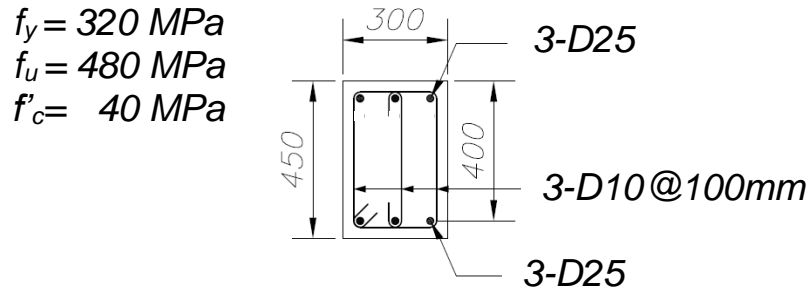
Material properties and beam section details (longitudinal reinforcement ratio ρ_s of 1.23%) used for the section analysis.
